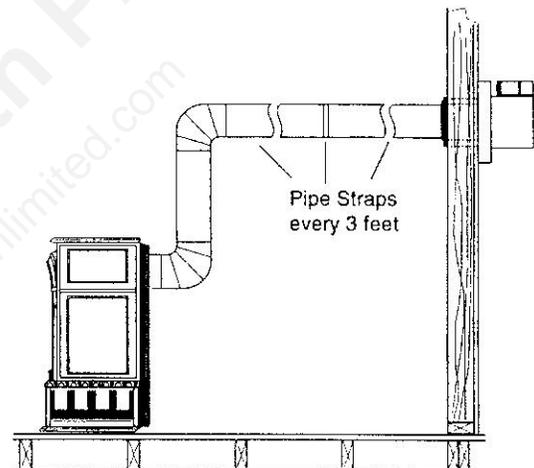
Use pipe straps to support horizontal runs of vent pipe.
